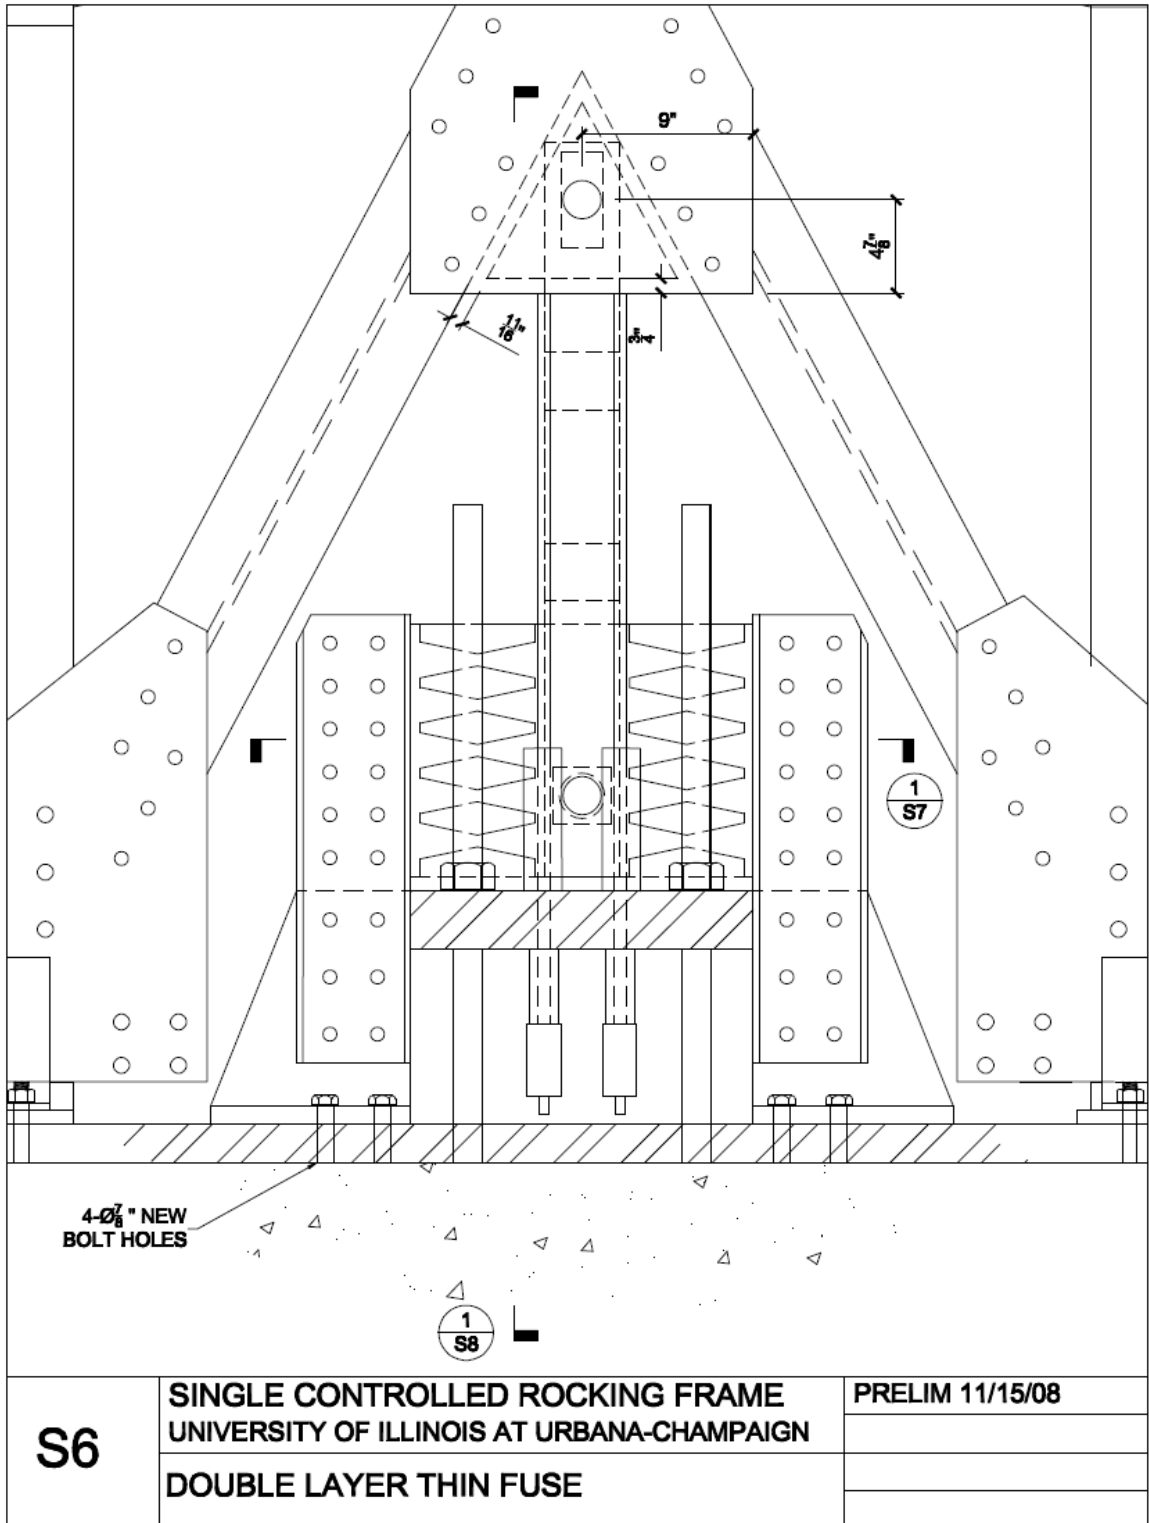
Design Drawing for the Single Frame Configuration – Specimen B2 Close-Up
